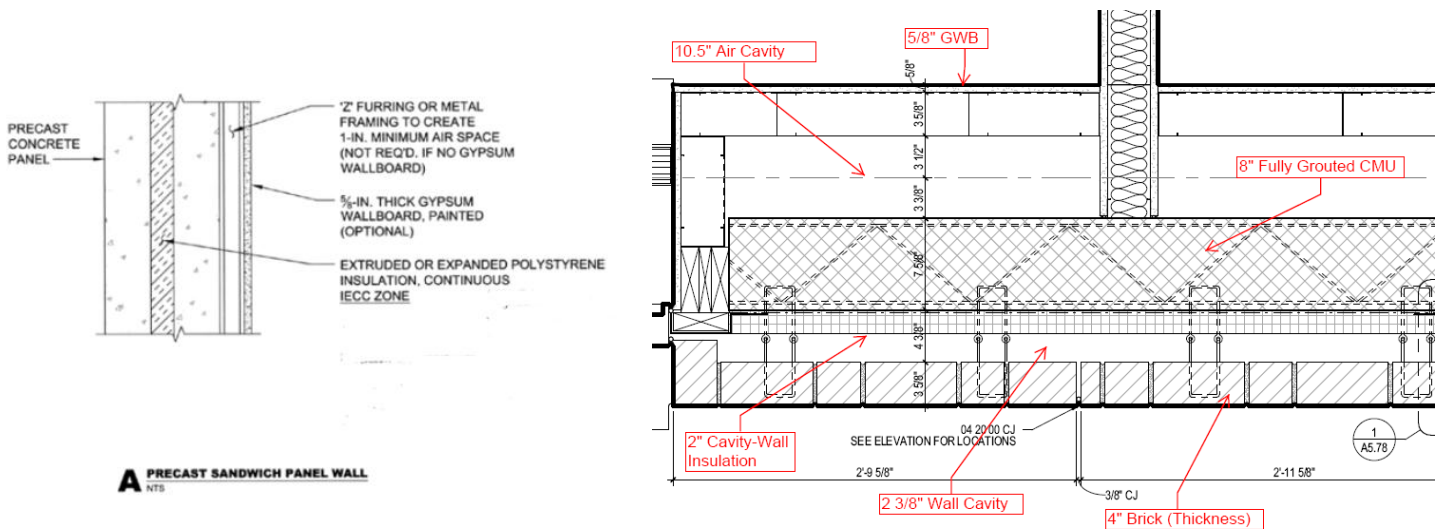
Typical Sandwich Wall Section (Left) & Typical Existing Wall Section (Right)
